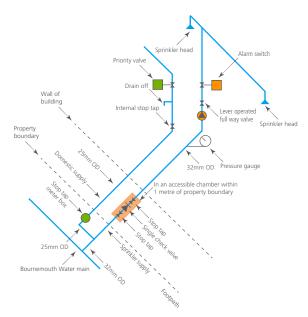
Typical Mains Fed Sprinkler Installation for Domestic Property
